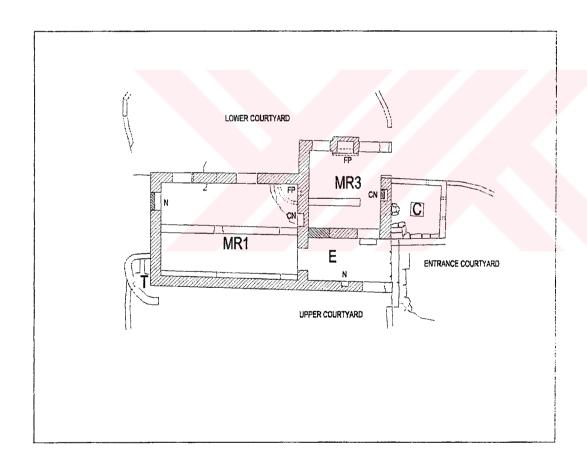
Plan Scheme of Selected House (D.3.15)
